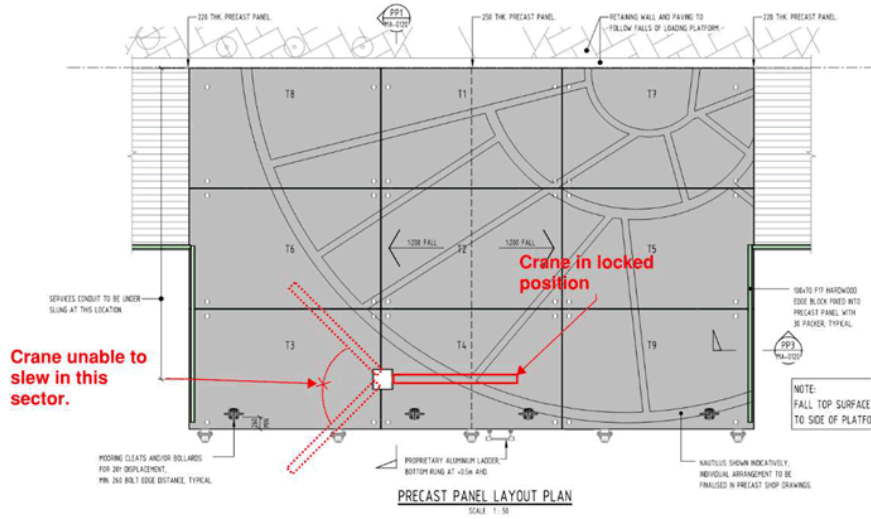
270 Degree Crane Slew When Installed at the Crane's Intended Location
